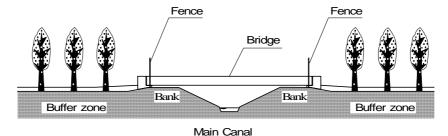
Cross-section Plan of the Main Canal along the Disposal Site
